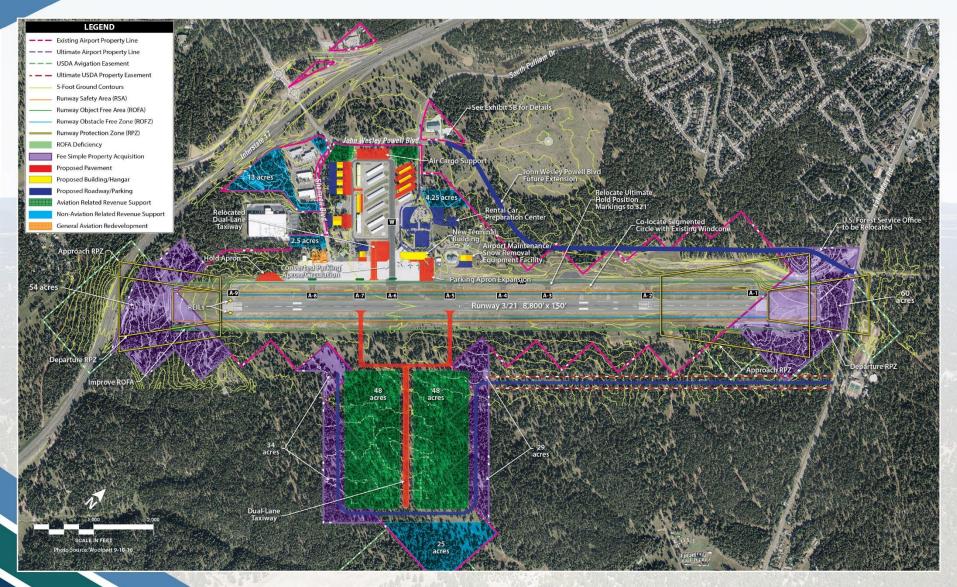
B RECOMMENDED MASTER PLAN CONCEPT TERMINAL AREA PLAN
